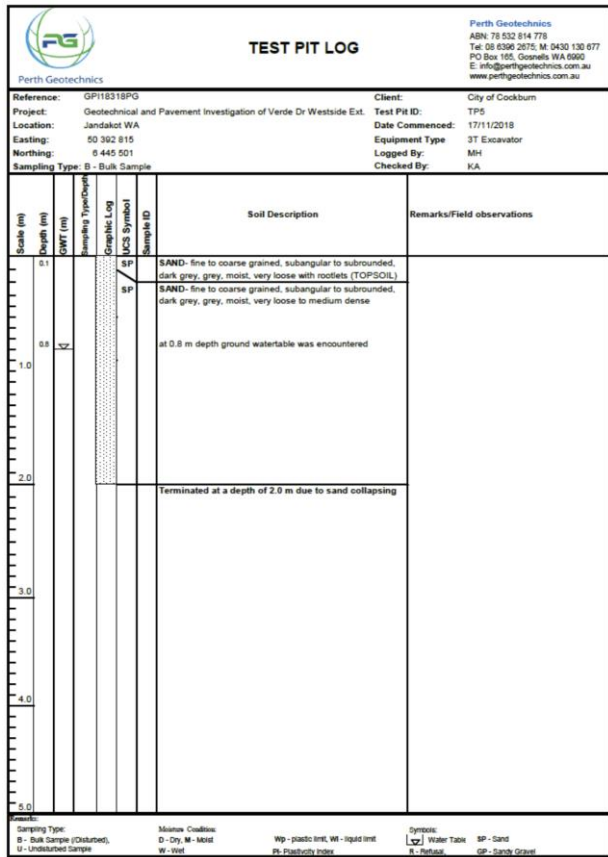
Test Pit Log (Verde Dr.) at Location TP5
